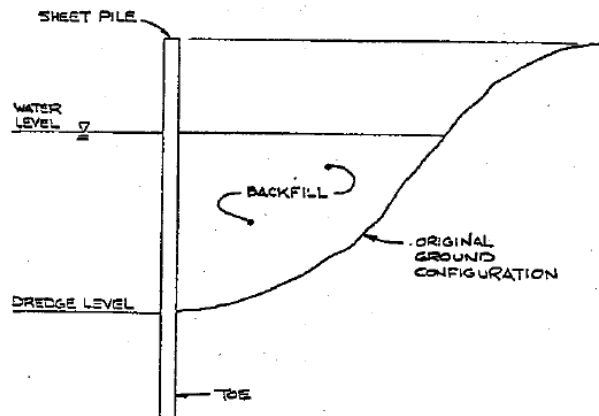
Cantilevered Sheet Pile Wall (Saczynski and Kalhawy, 1982: 14 cited in Burgess & Hulhaway, 1983: 104)
